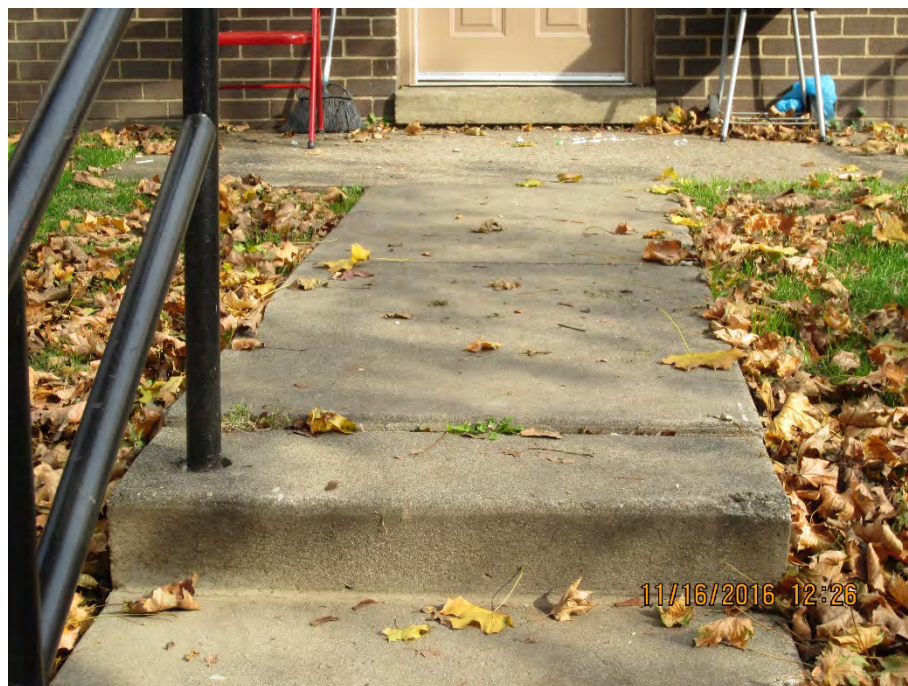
Grind & caulk 3' slab [Plan Sheet SP-2]
